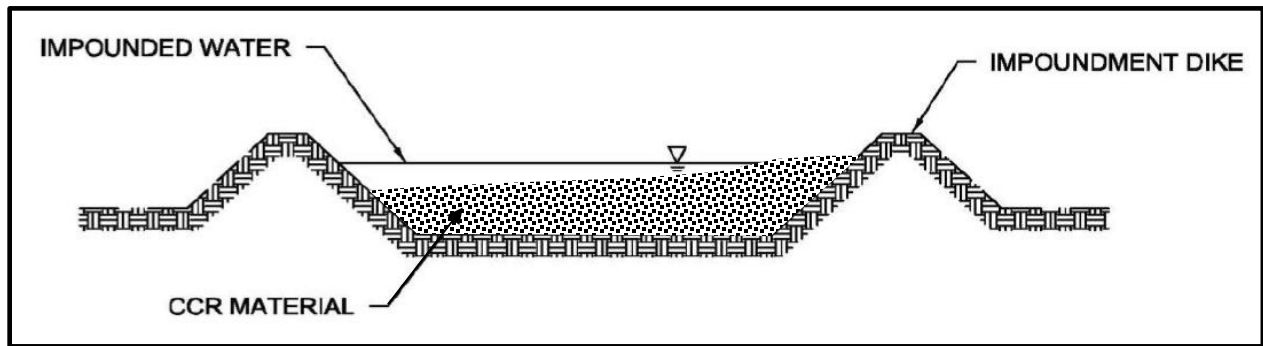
Typical Cross Section of The Bottom Ash Pond
